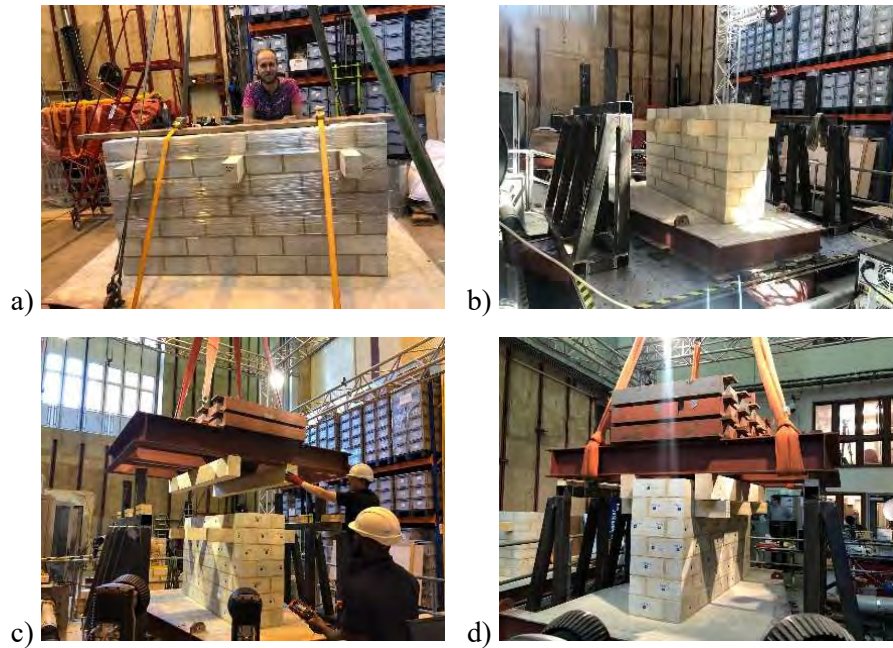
Assembly working phases: a) Securing the wall before lifting; b) placement of the wall + base + support system on the ES; c) lifting and placement of additional mass and frame top; d) final specimen set-up
